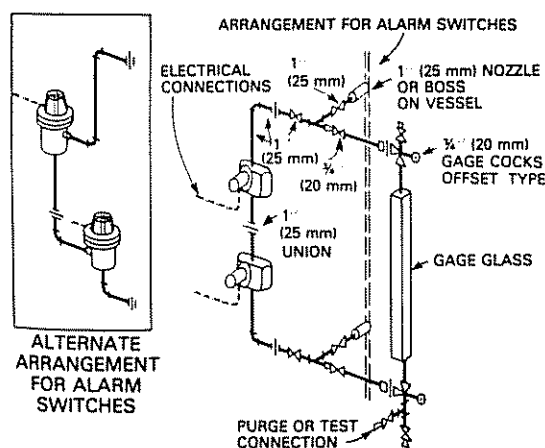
Arrangement of High- and Low-Level Alarm Switches With Parallel Gage Glass
